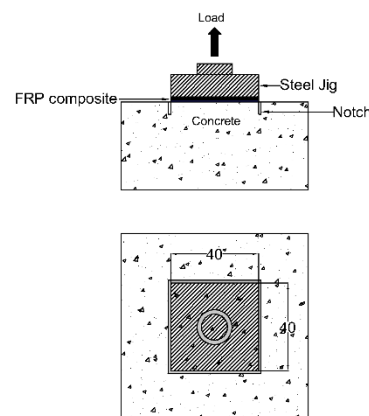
Details of direct pull-off test specimen (unit: mm)
